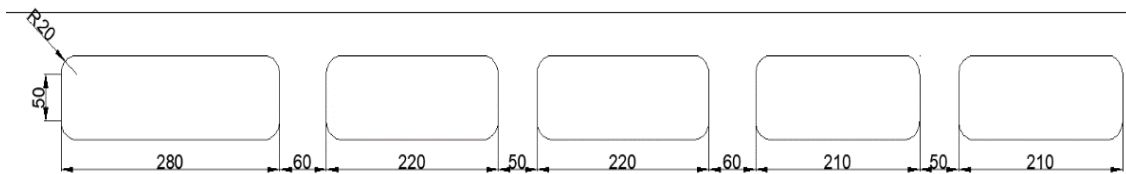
Dimension drawing of web opening of light frame bridge (cm)
